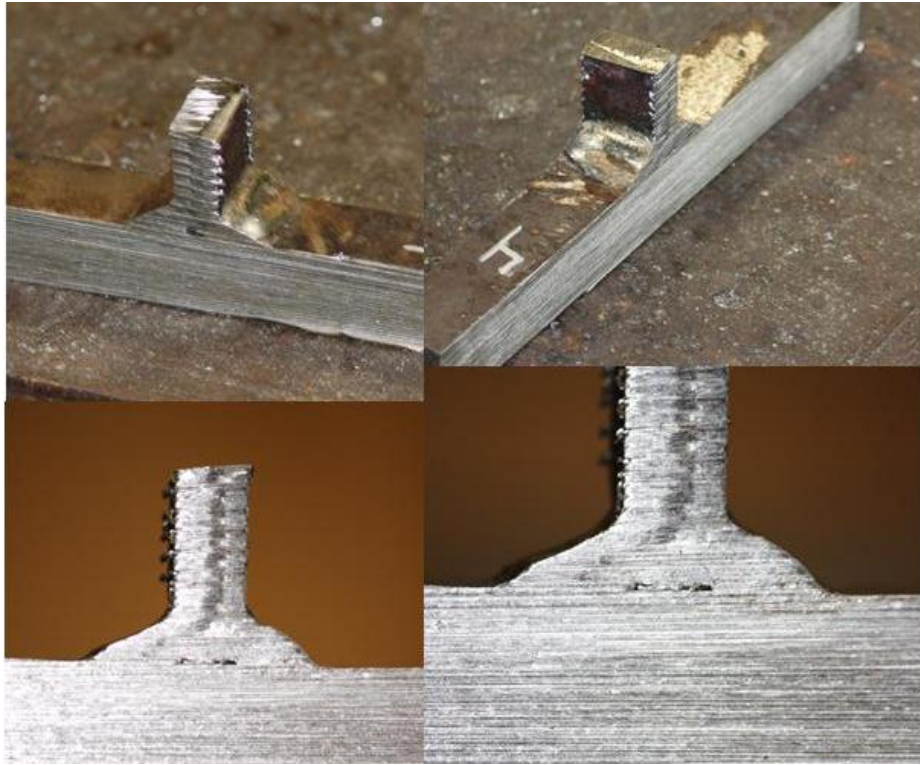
A piece of the beam that is to be tested for fatigue cracks is cut into five, narrow sections using a band-saw (this is the perpendicular stiffener from beam 30A)
